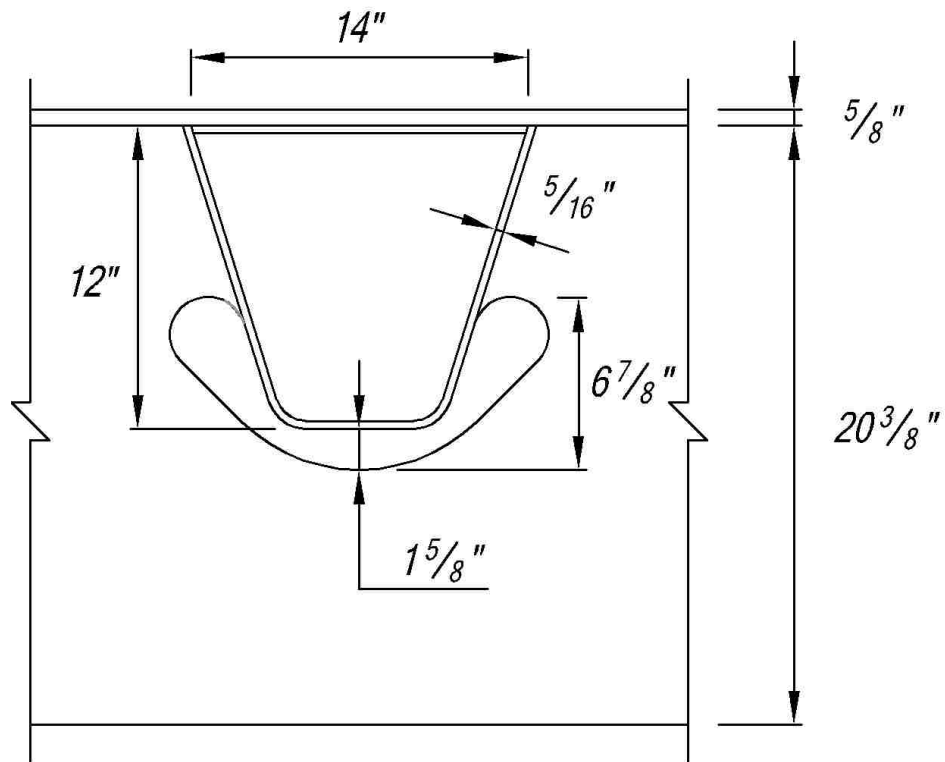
Dimensions of the Verrazano Narrows Bridge rib-to-floor beam connection
